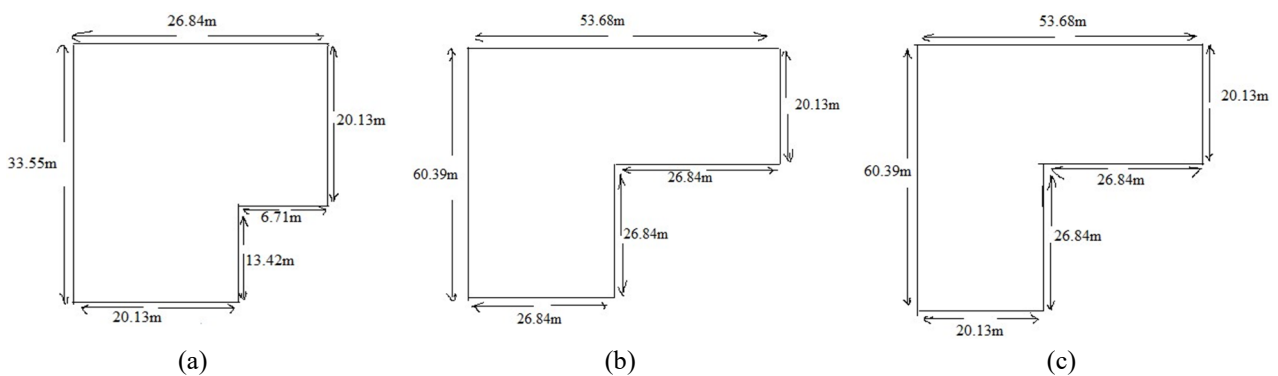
(a). Floor plans for (a) ground floor; (b) first floor; and (c) second floor of PHT
